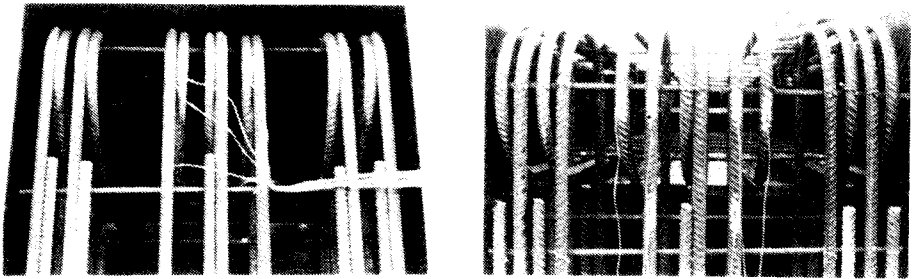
Specimens with a large amount of reinforcement (RV5 and RV6). The reinforcement loops were spliced in contact with each other (left) or with space between the loops (right).
